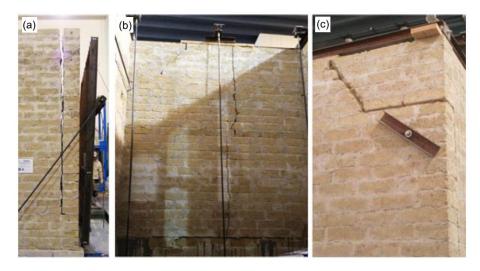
Damage pattern before the installation of SRG reinforcement [3]: lateral view (a), back view of the façade (b), detail of the anchorage of the reinforcing tie rod (c).
